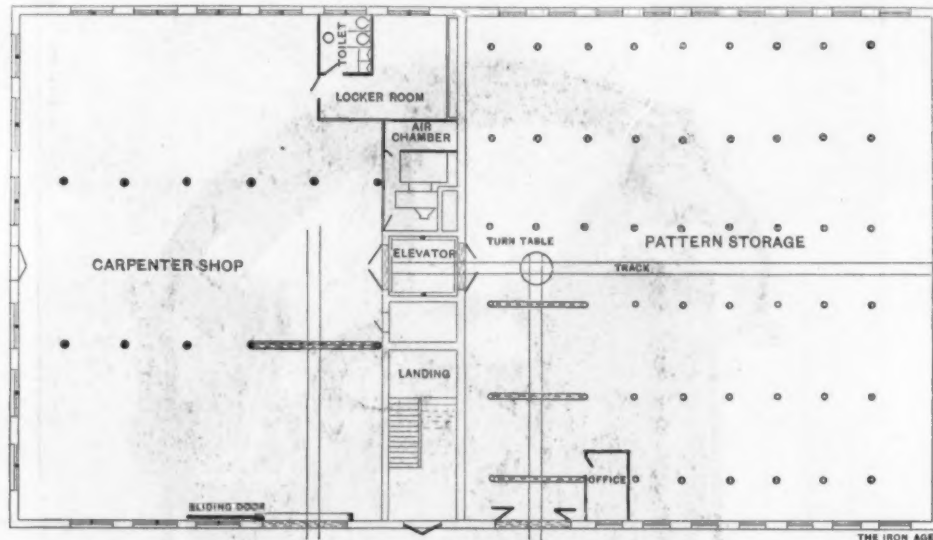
Plan of New Pattern Building of B. F. Sturtevant Company, at Hyde Park, Mass.
